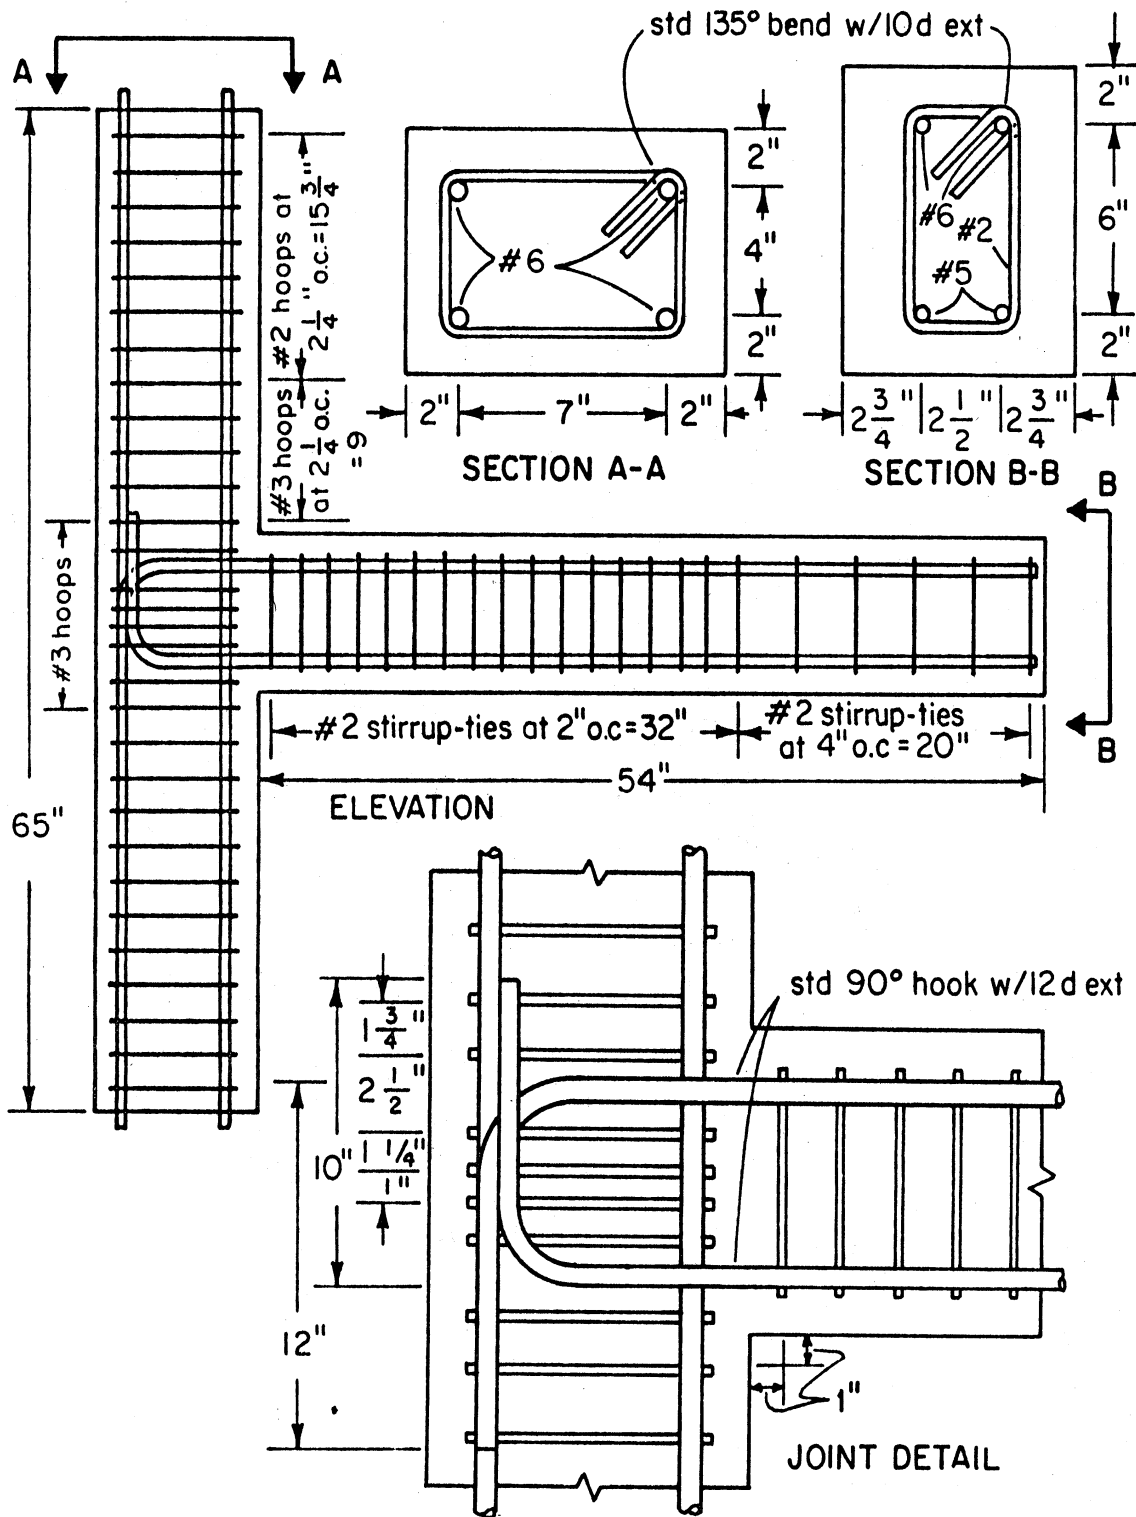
(b) Details of Beam-Column Subassemblage for Type II Design
